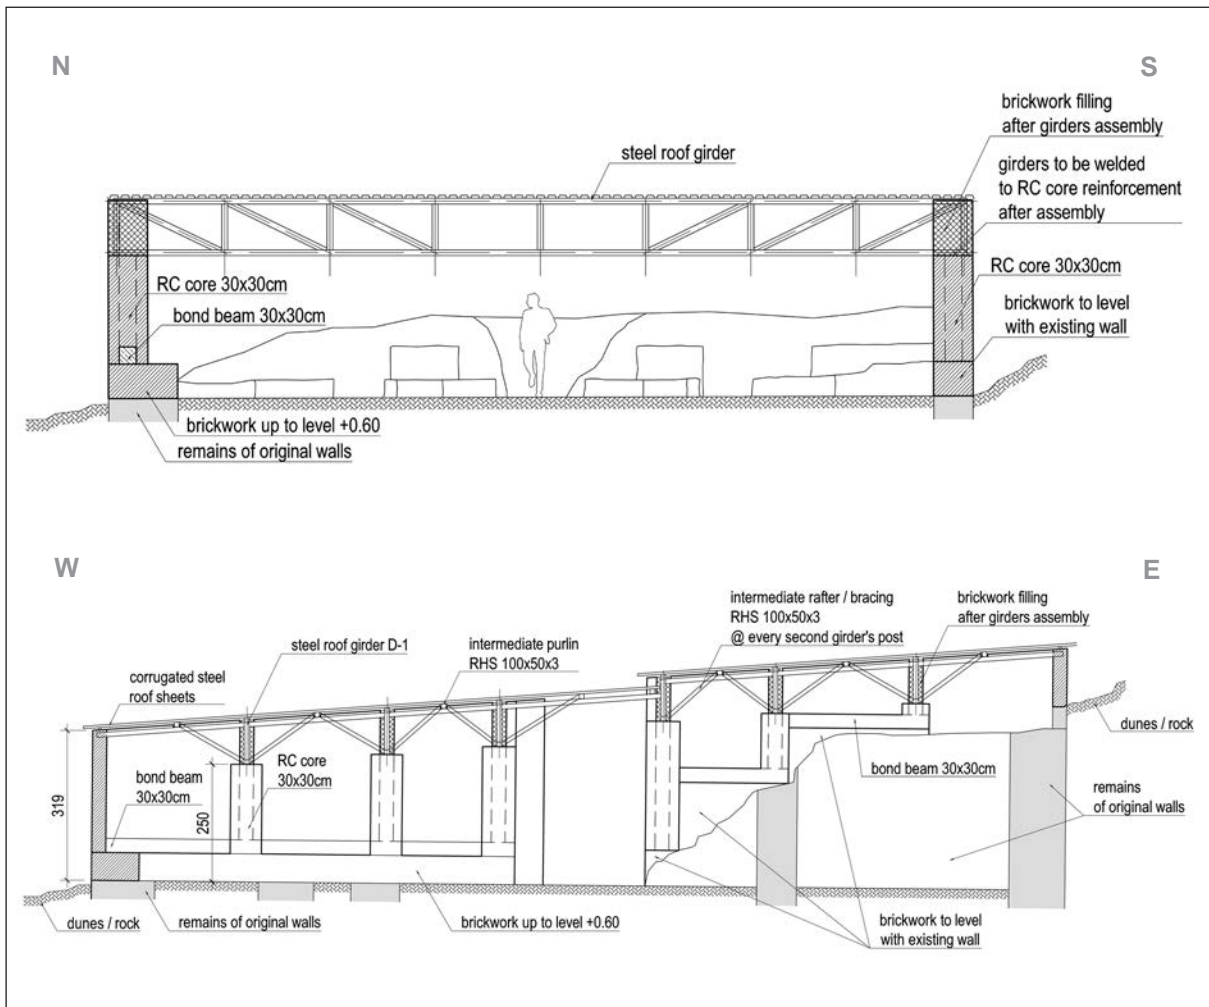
Sections through the Church of Archangel Raphael (SWN.B.V) showing new structural elements
